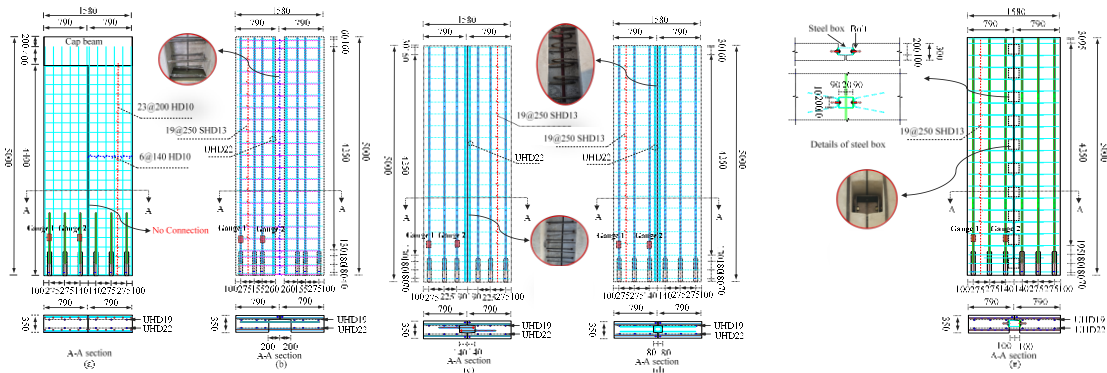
Details of specimens: (a) Specimen CC; (b) Specimen CL; (c) Specimen CH; (d) Specimen CW; (e) Specimen CS
